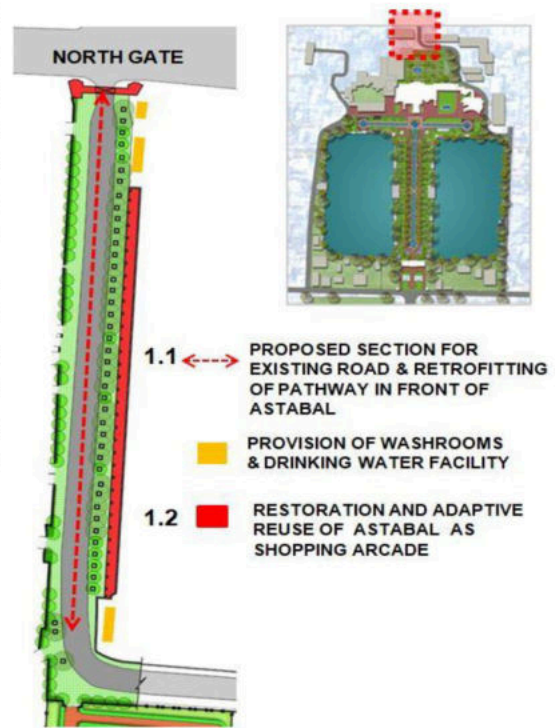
PROPOSED ELEMENTS ON THE ASTABAL AND NORTH GATE SITE
